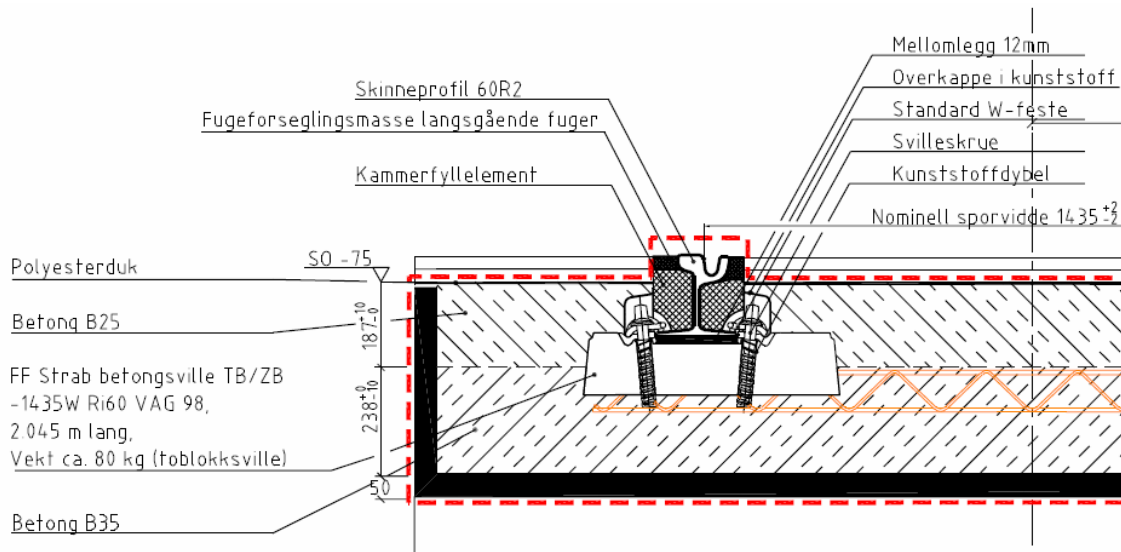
Section through the track construction in the city streets. The embedded rail system is the fastening of the rail in the concrete slab. The drawing is from the tender document. Other system could be suggested from the tenderer.
